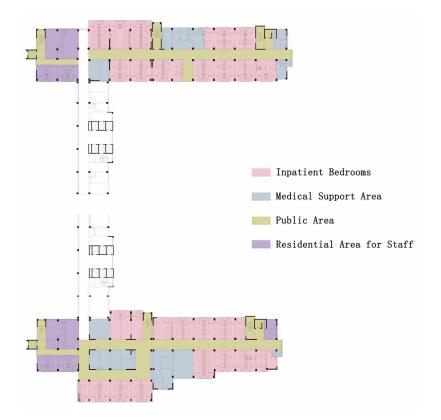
Floor plans of wards (Up: Model A; Down: Model B) (Adapted from the floorplans provided by the hospital)
